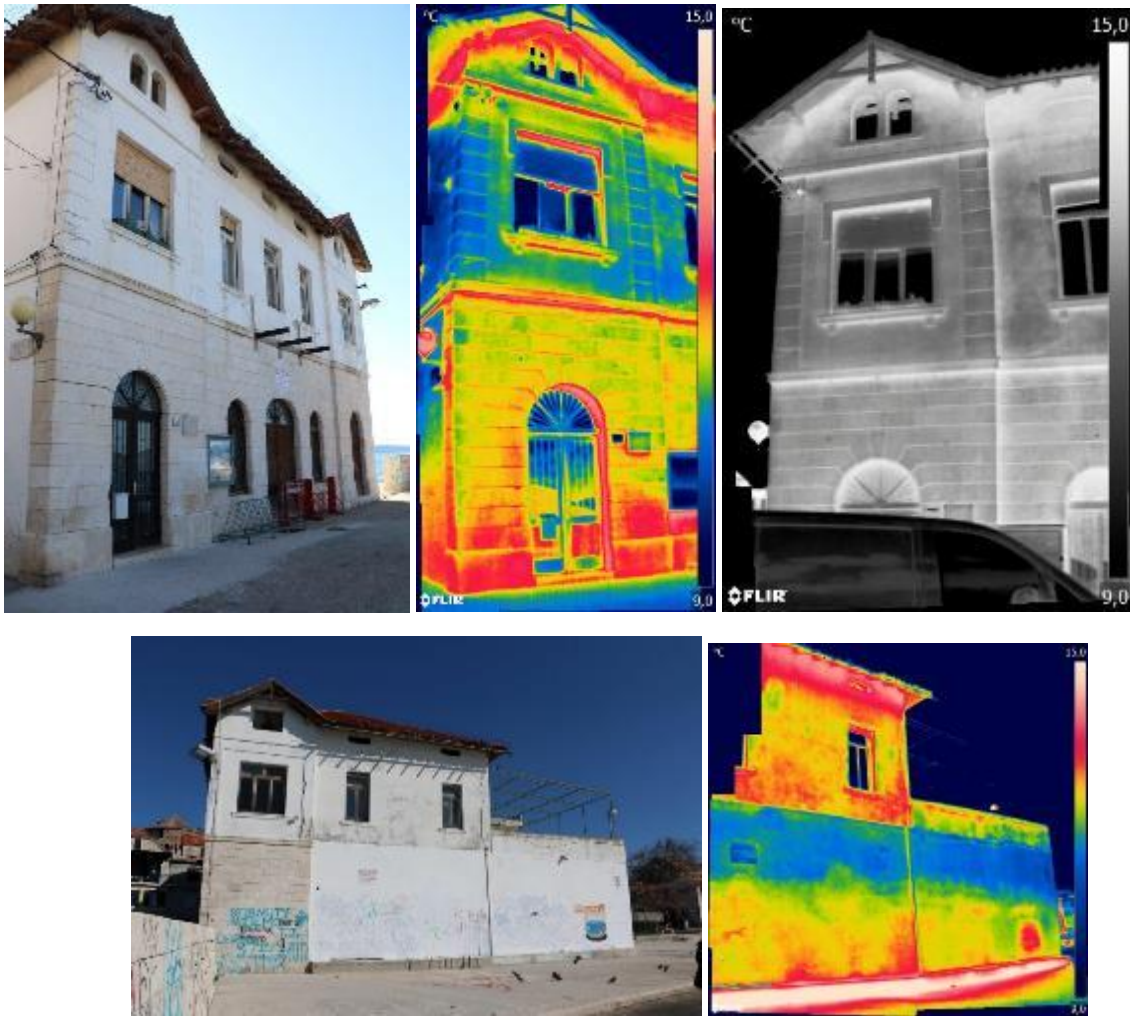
Rowing club: the ground made of unreinforced concrete, the first floor was built of stone and clay blocks, existence of rigid concrete floors.
